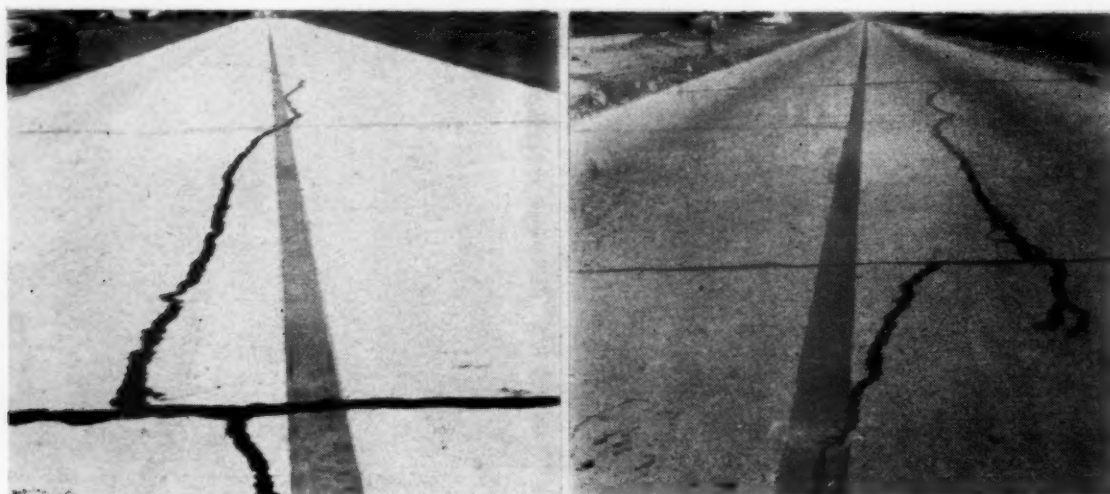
TYPICAL LONGITUDINAL CRACKS IN THE 1942 PAVEMENTS OF ILLINOIS.
